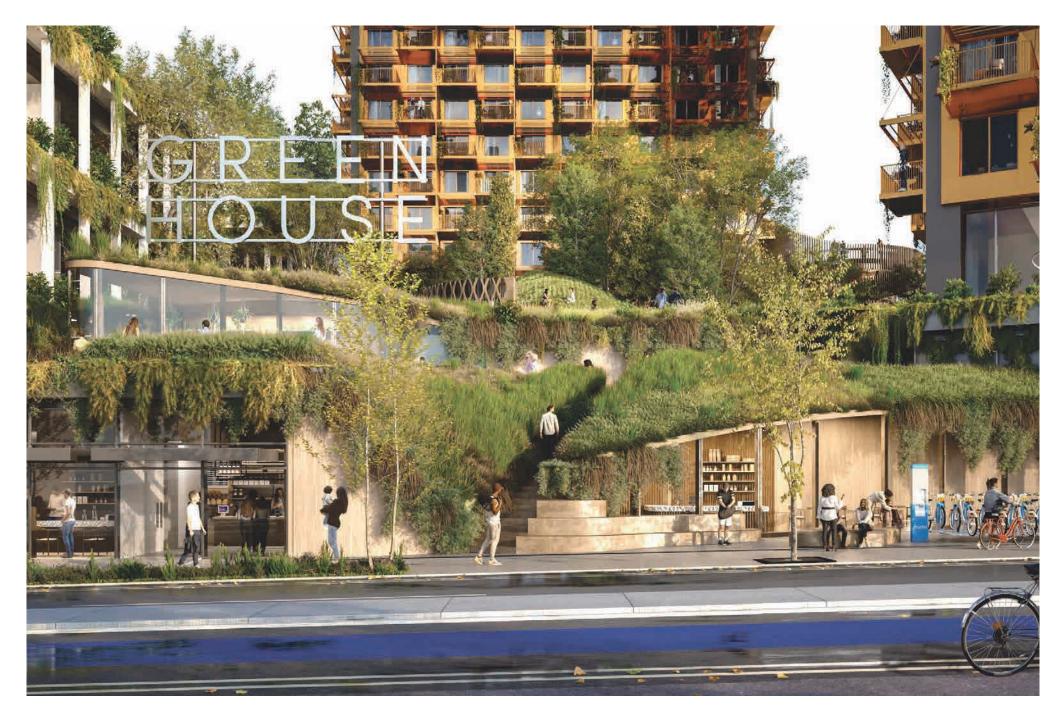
Perspective of Garden terracing down to E 10th Ave
